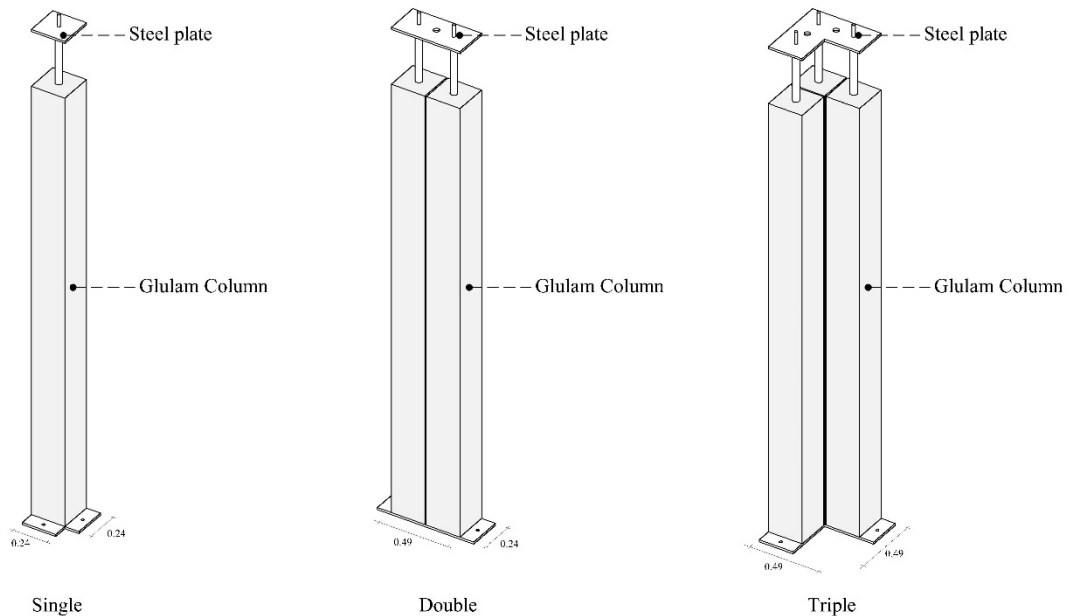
Glulam columns configuration of CREE system (Modified from CREE Buildings)
